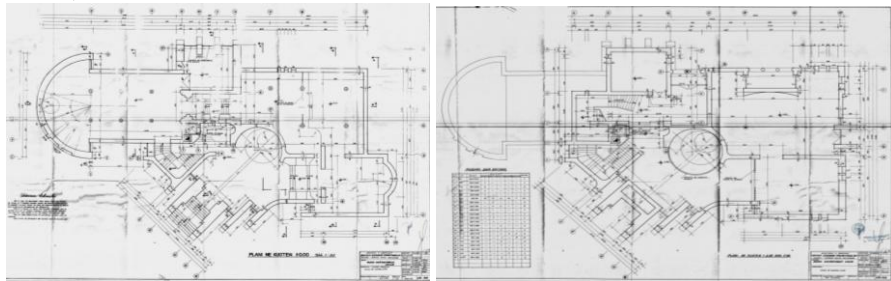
(Up: Ground floor plan), (Down: first floor plan) (Archive of the Construction Institute, Tirana,
